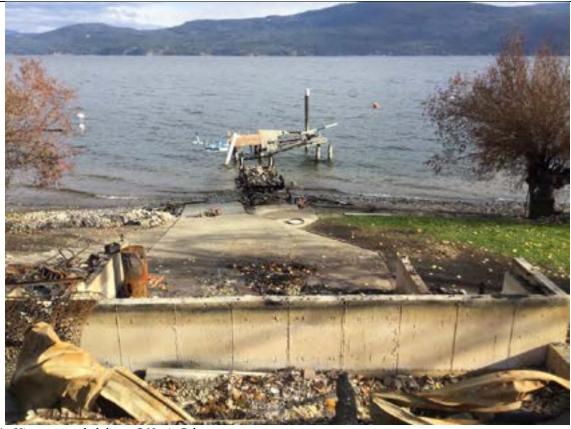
View of foreshore area at 2 Nerie Rd. with concrete retaining wall.
